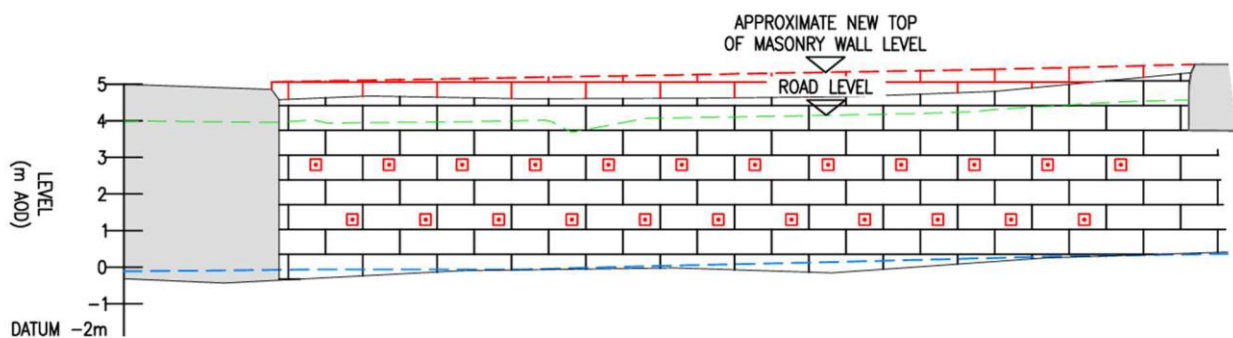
Drawing of anchor contact points for stabilisation of the retaining wall
